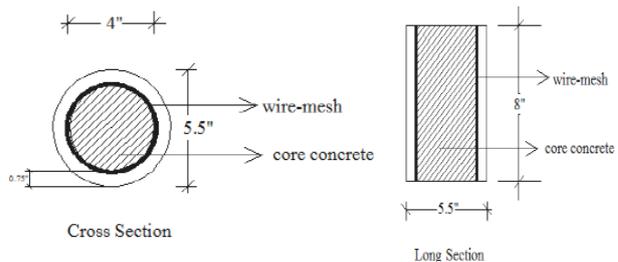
Detailing of the Section (Confined by one layer of ferrocement overlay) [10].
